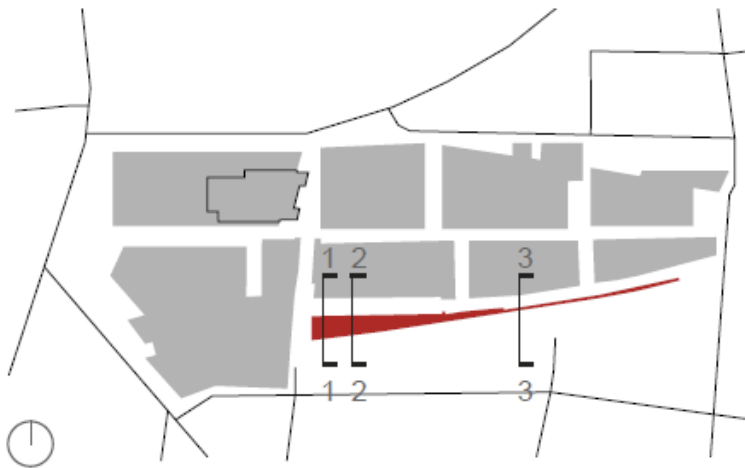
Plot 7 shaded red on site plan (also includes London Road route to the north)
